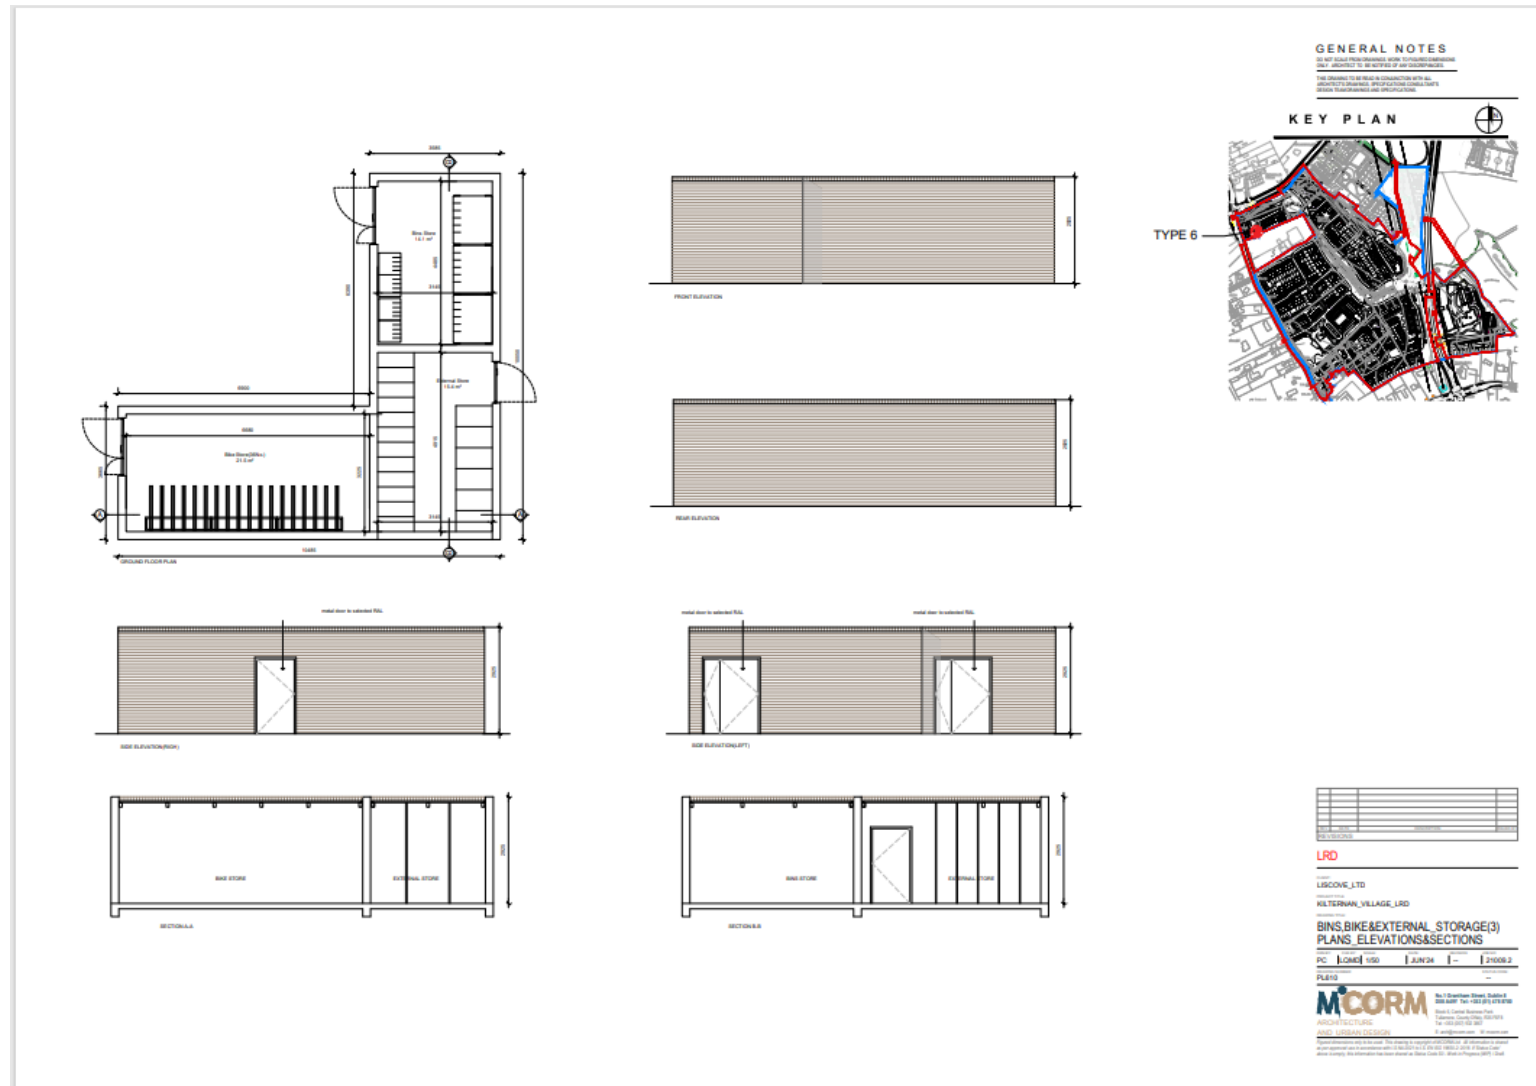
Internal Layout of Waste Storage Area Type 6
